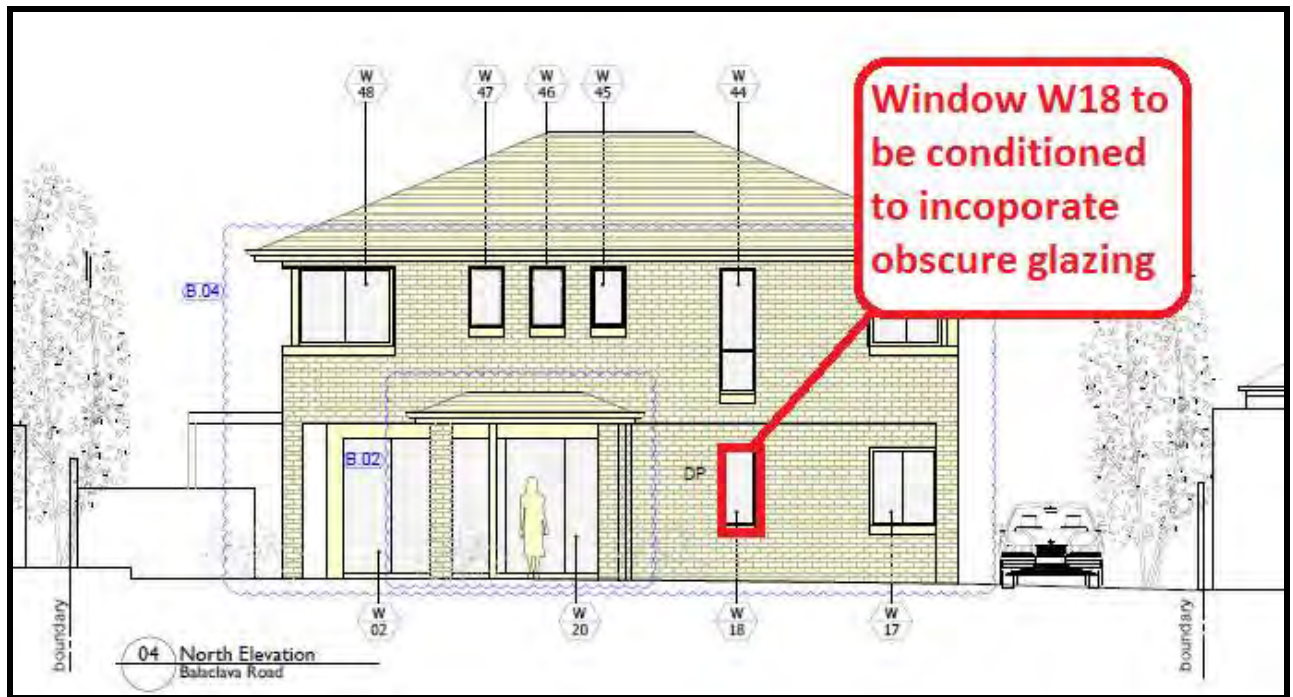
Front facing bathroom window on western elevation to be conditioned to incorporate obscure glazing
